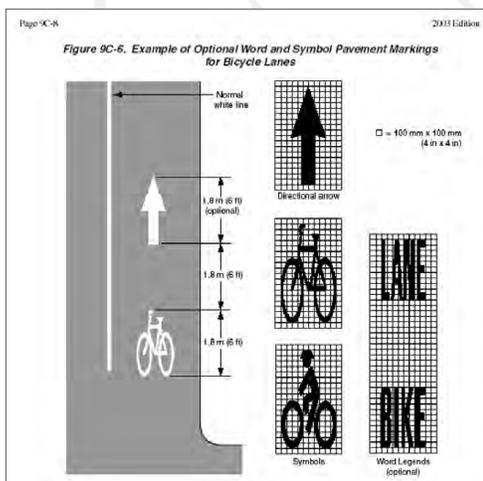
Typical pavement markings for bicycle lanes from the MUTCD.
